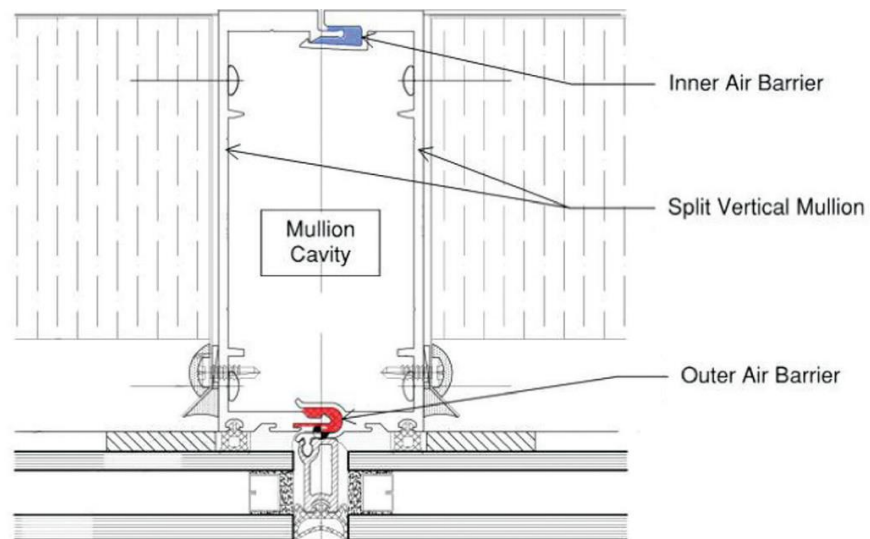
“Unitized curtain wall split mullion showing the air barriers required for ventilation to the mullion cavity” (Walsh, 2019)
